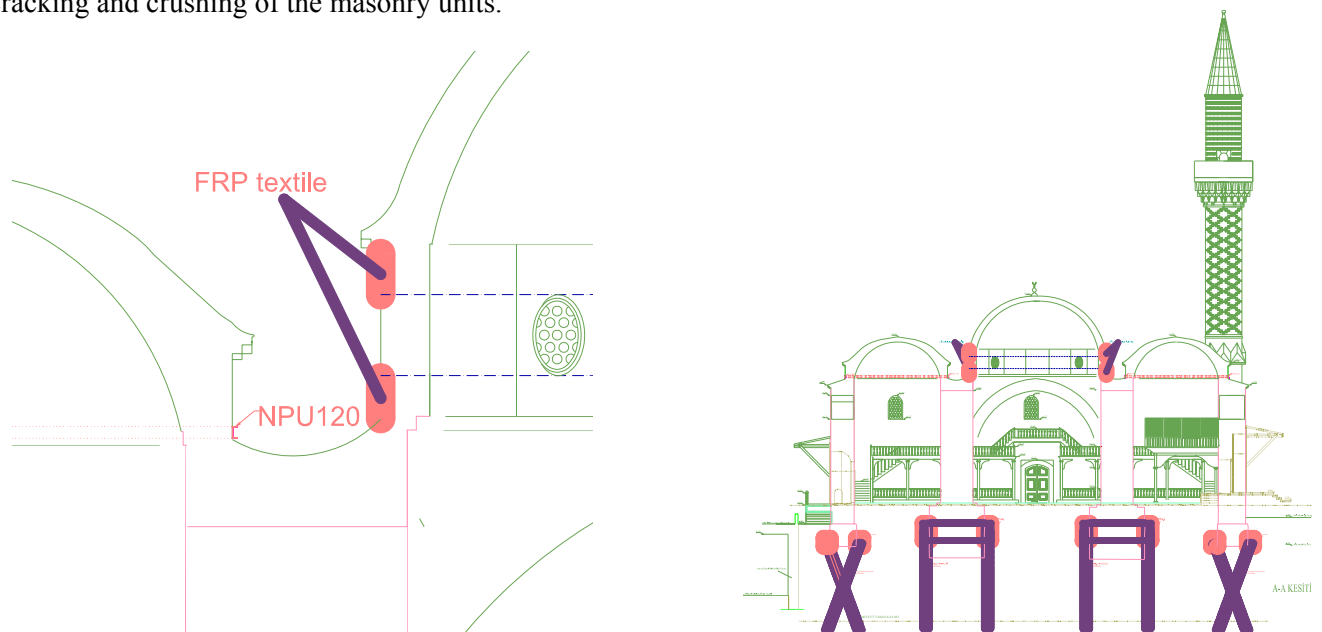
Strengthening of vaults and domes and foundation strengthening of the building
